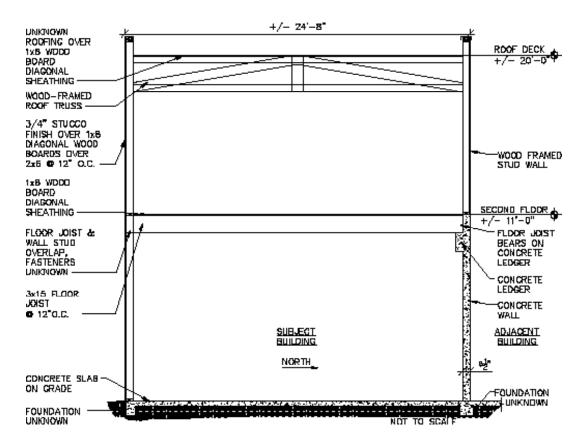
Sketch of typical building section looking westward, Howard Carter Associates, Inc, 2024.
